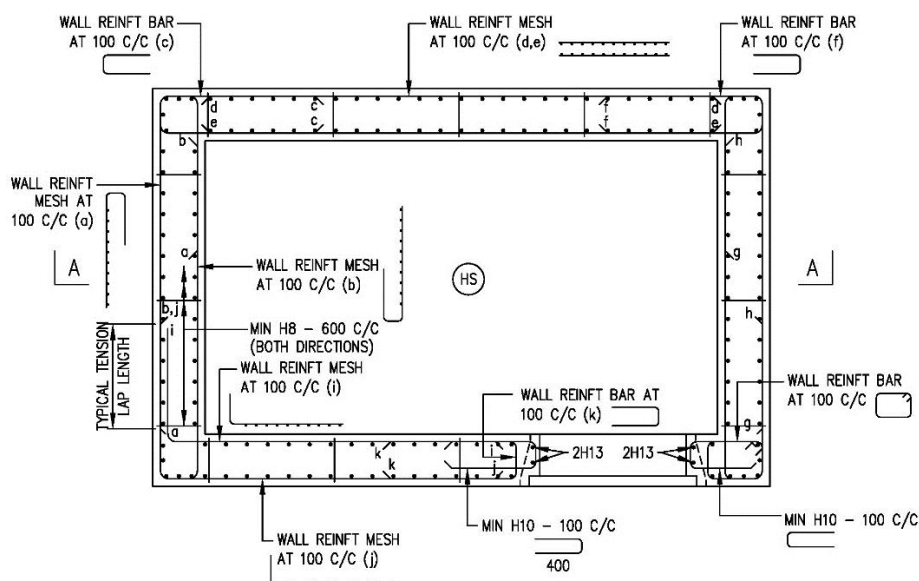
PLAN OF HS WALL AT DOOR OPENING
